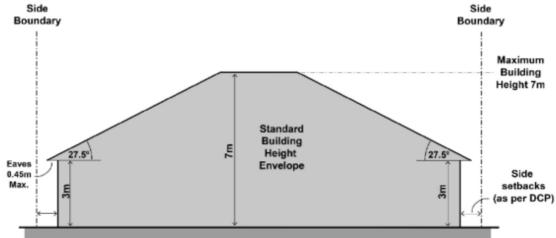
Building envelope for residential dwellings surrounding Oran Park House
